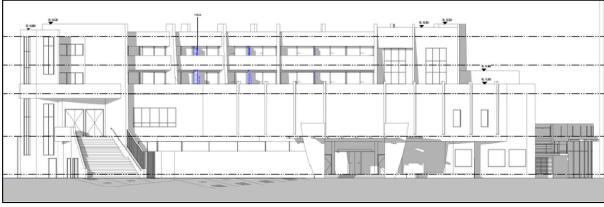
NORTH-WEST ELEVATION (MORSON GROUP)
